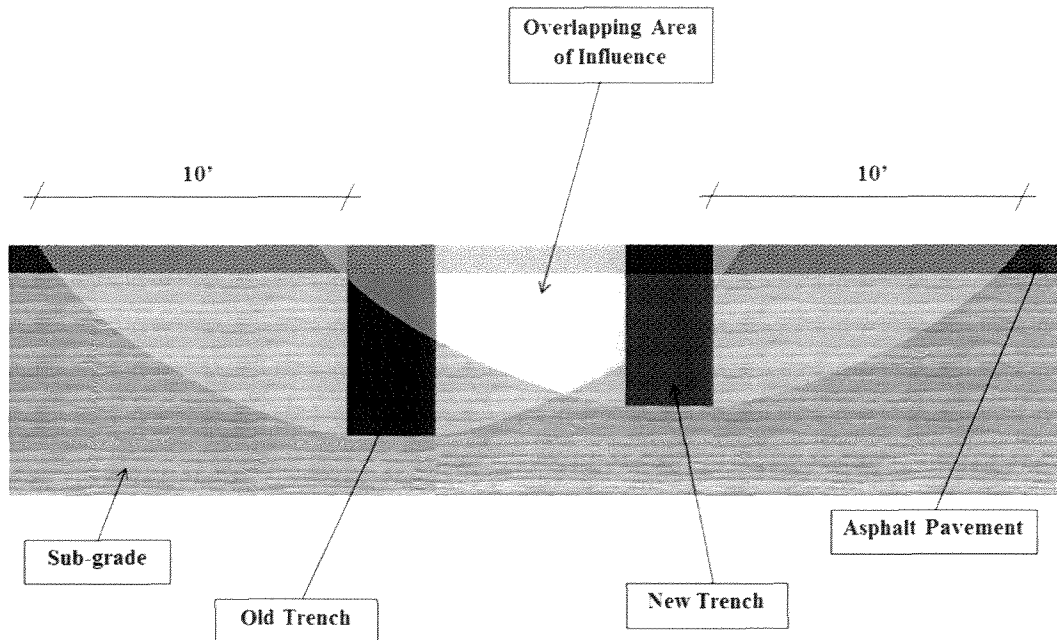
Sketch of Overlapping Area of Influence under pavement.
